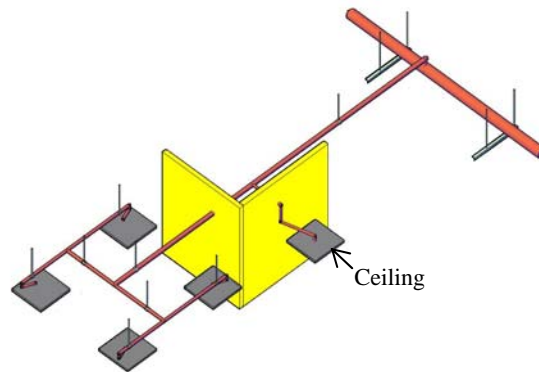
3D scheme of the sprinkler piping subassembly
